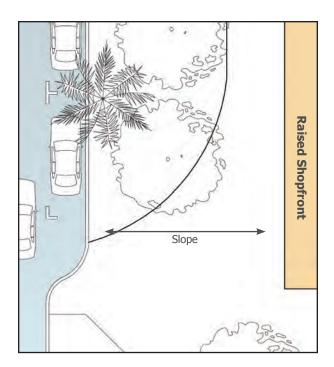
Plan View, Raised Shopfront Frontage (Illustrative)
